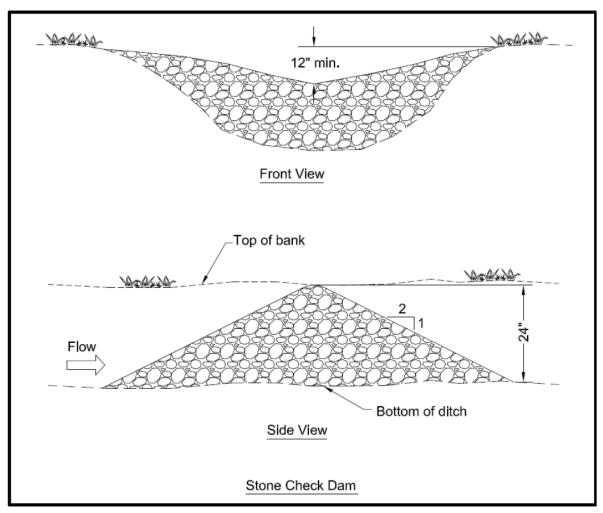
Profile and Cross-Section of Typical Rock Check Dams
